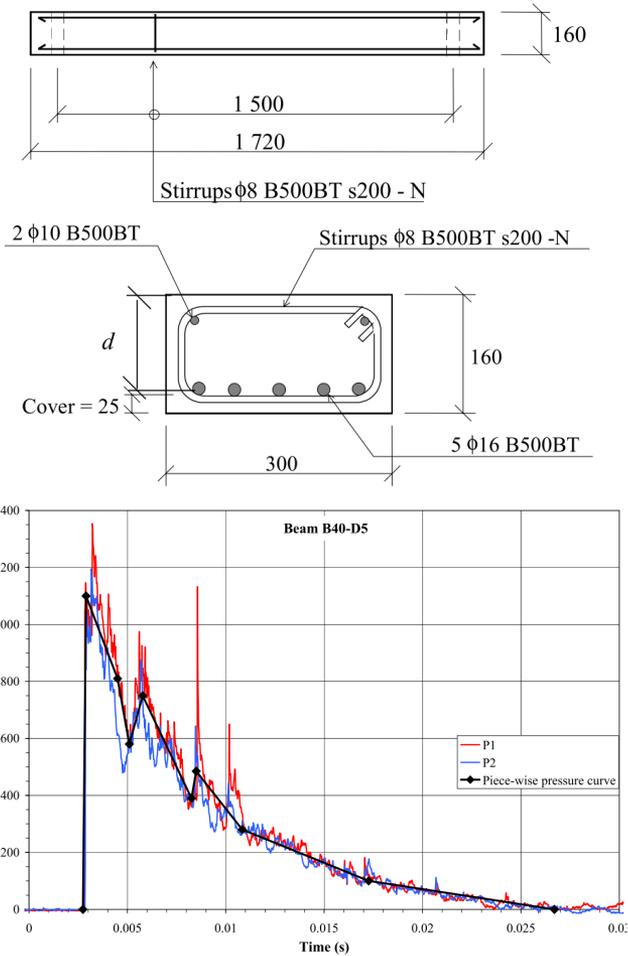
Geometry and reinforcement layout (above) and measured pressure over the beam and simplified load used in the analyses (below); both pictures taken from [4]
